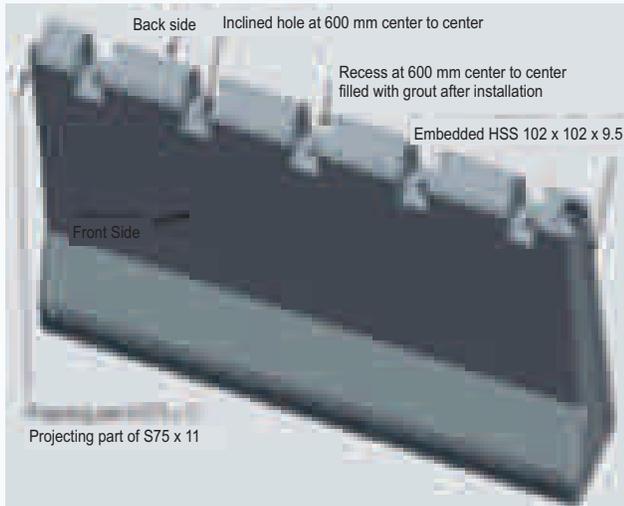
proposed precast Concrete barrier wall CONSTRUCTION DETAIL:
